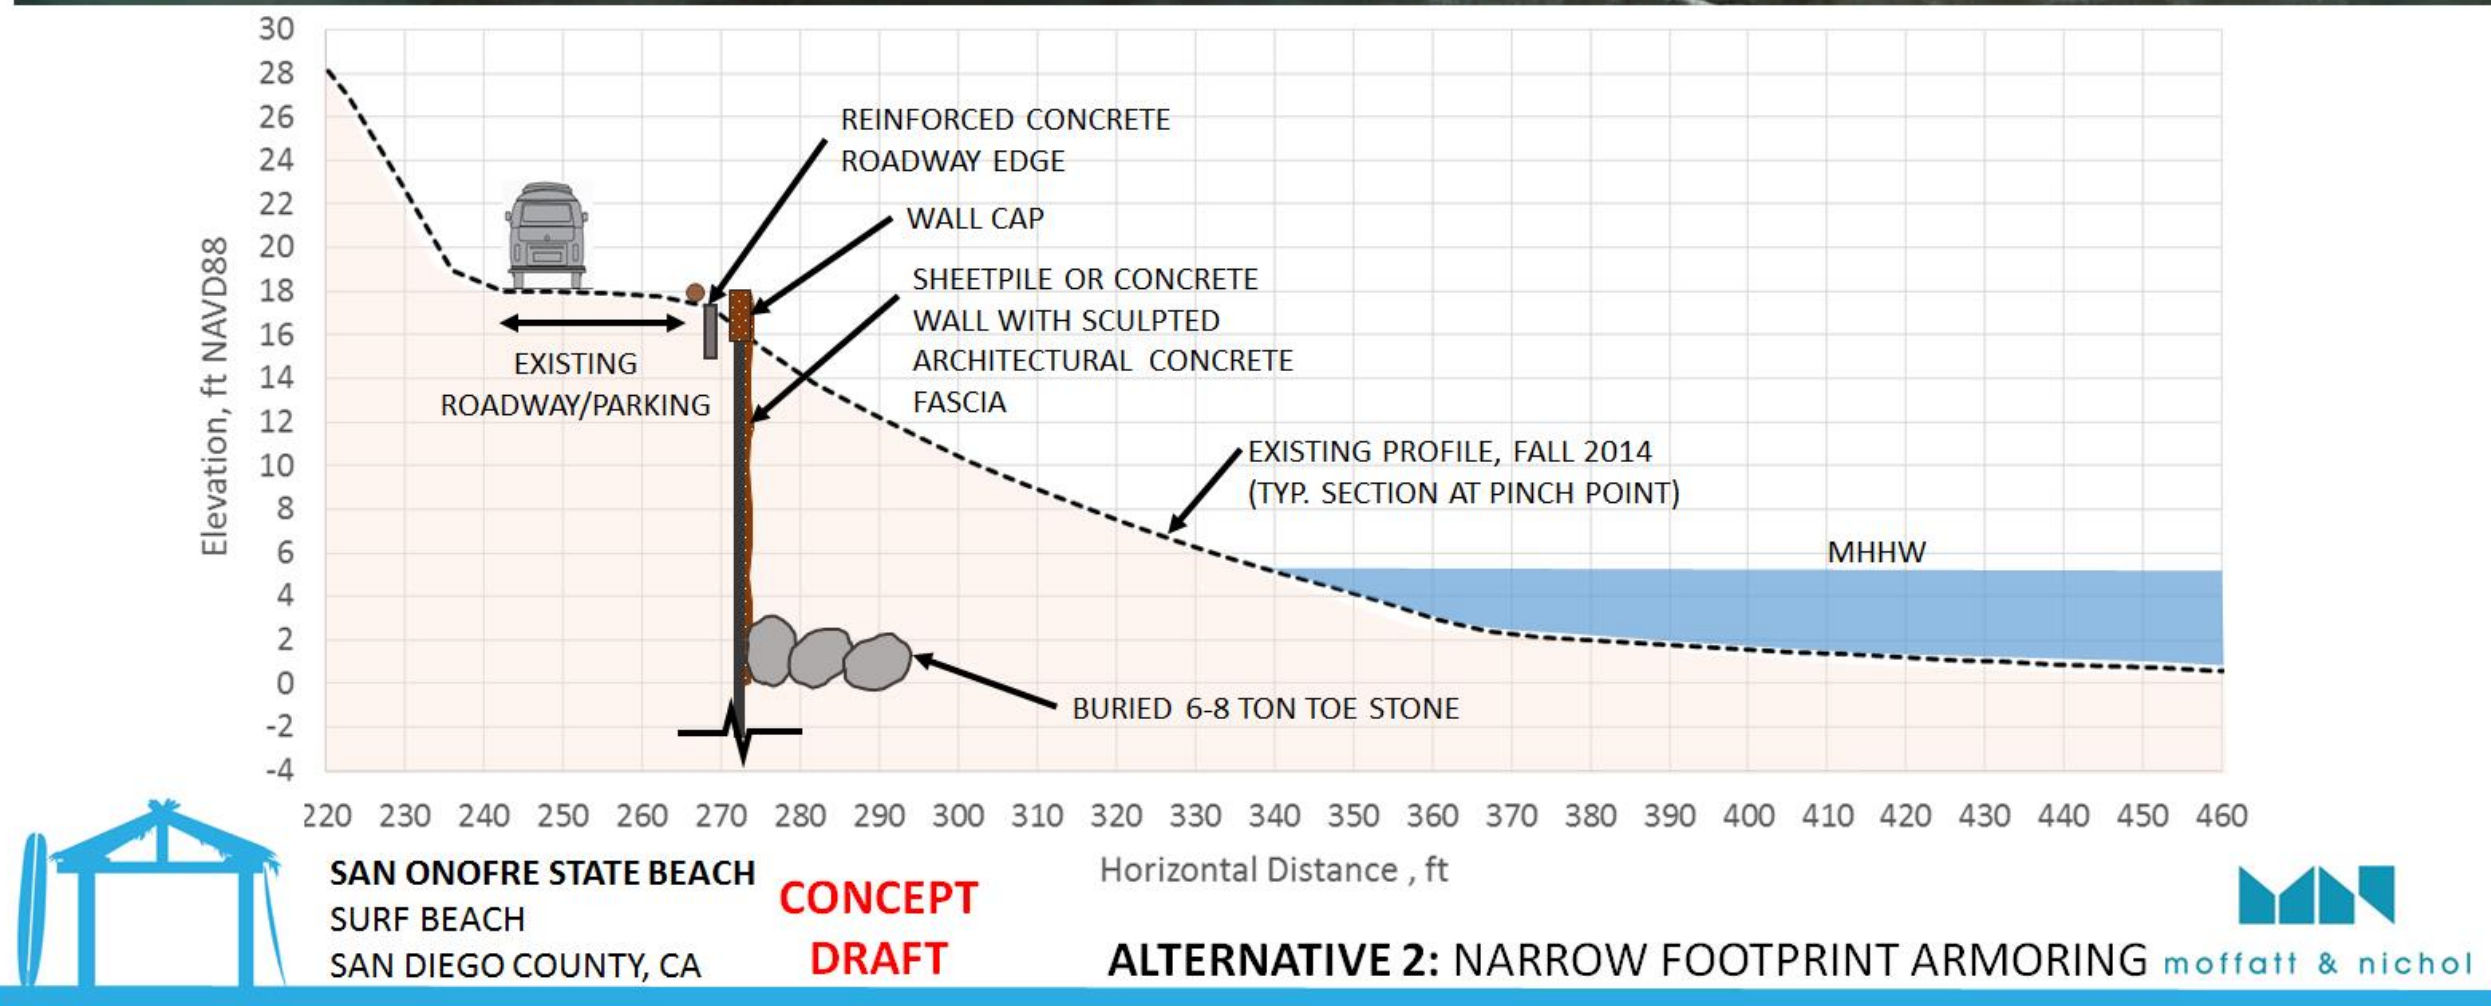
ALTERNATIVE 2: NARROW FOOTPRINT ARMORING CONCEPTUAL DESIGN
